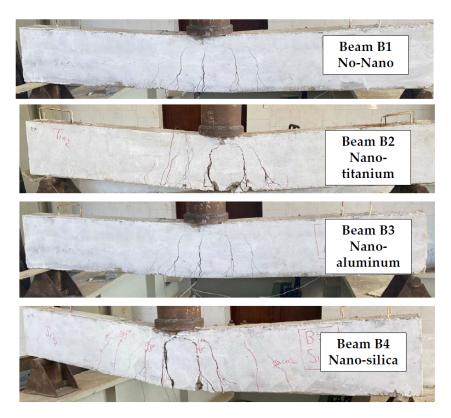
Failure modes for the tested RC beams subjected to cyclic loading.
